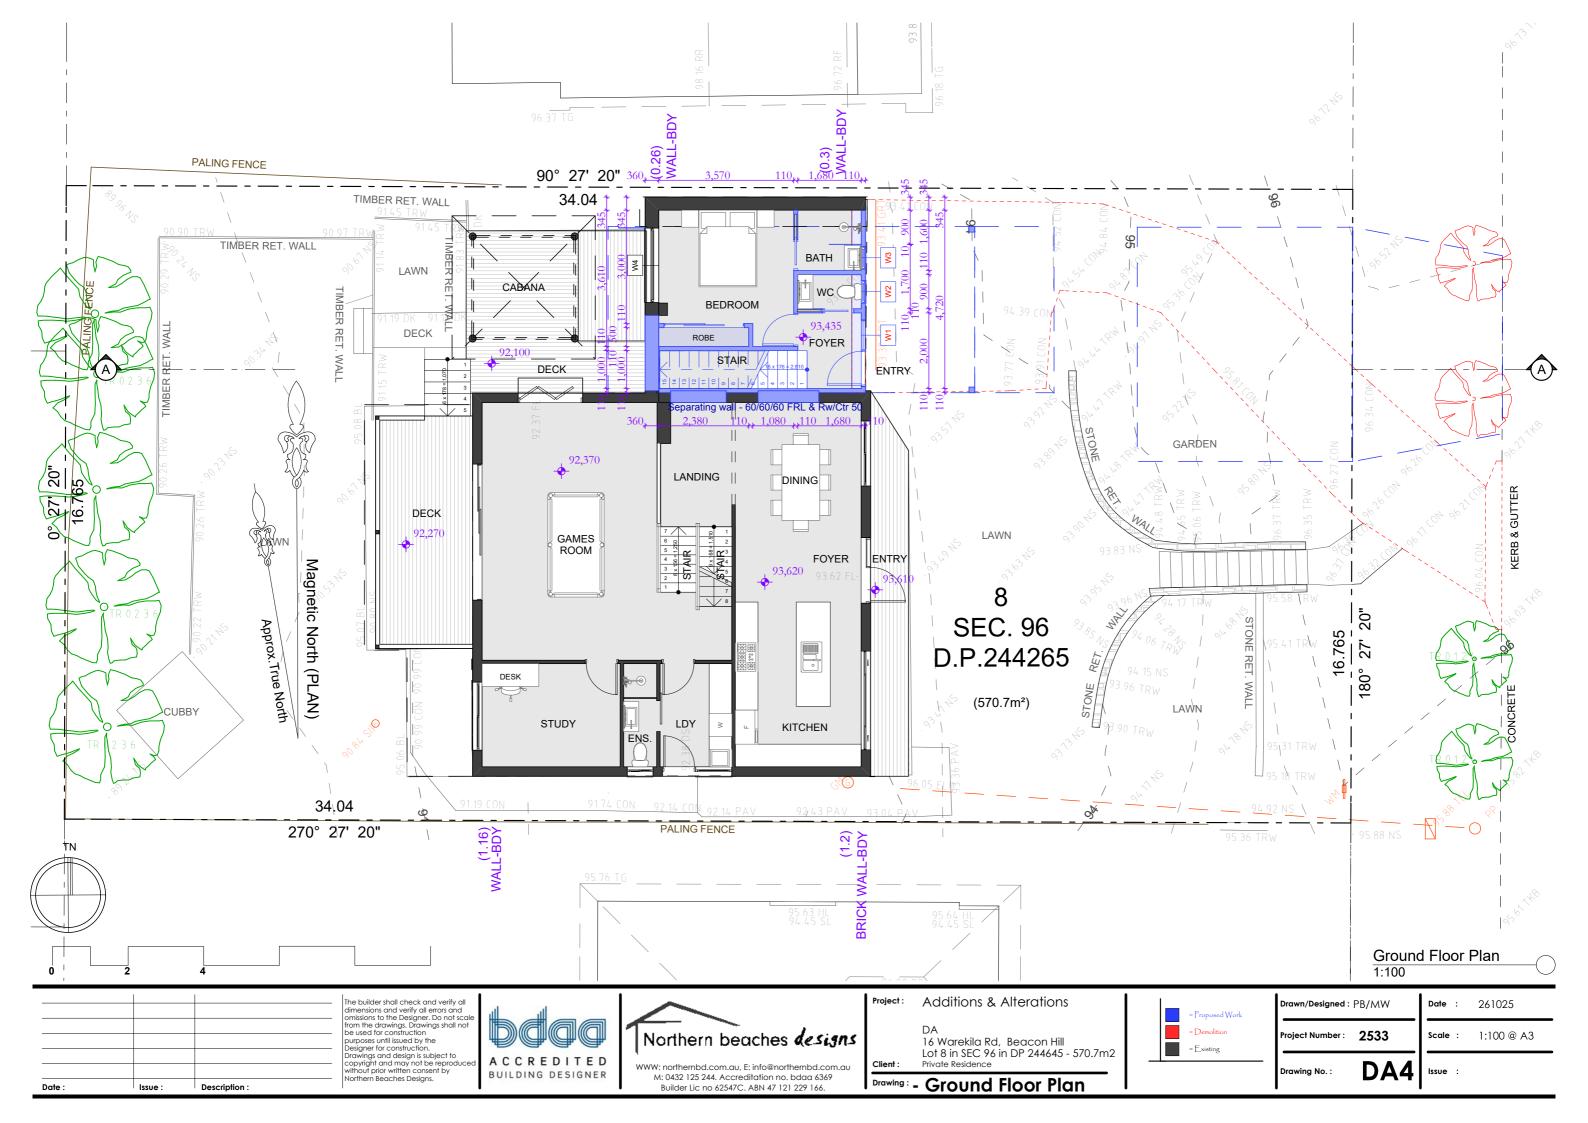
DETAIL AND LEVELS OVER 16 WAREKILA ROAD BEACON HILL NSW 2100
